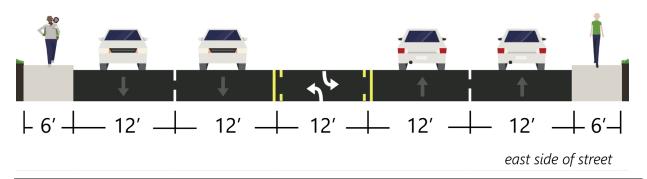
Typical Cross Section, Segment 6: 39th Street to 51st Street (looking north)
